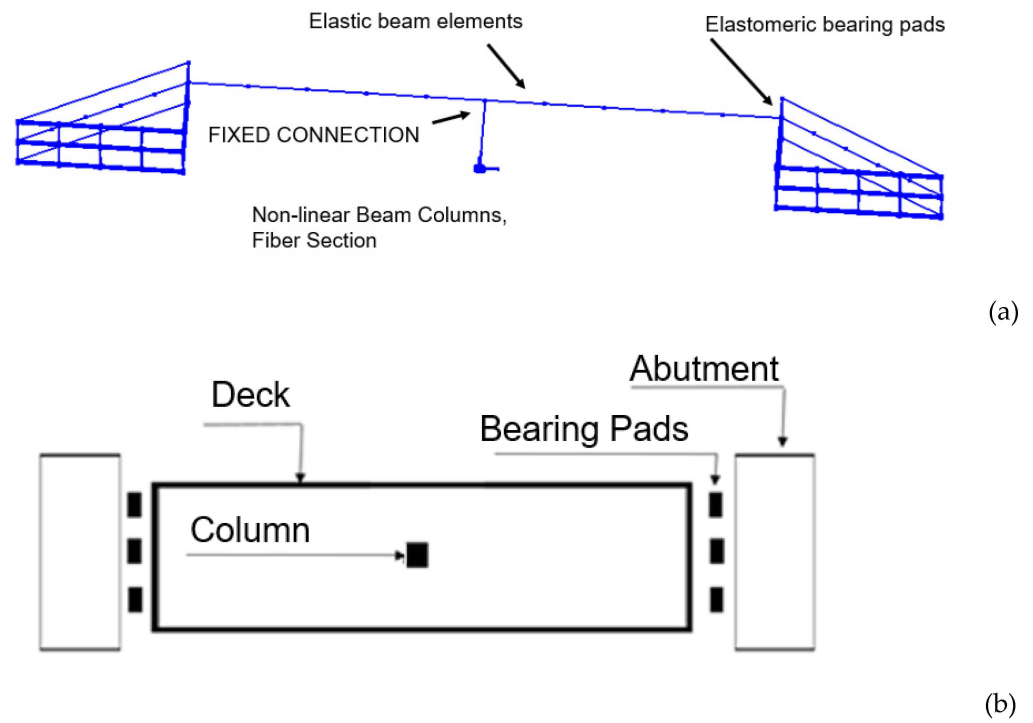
Bridge scheme: (a) Vertical view; (b) plan view.
